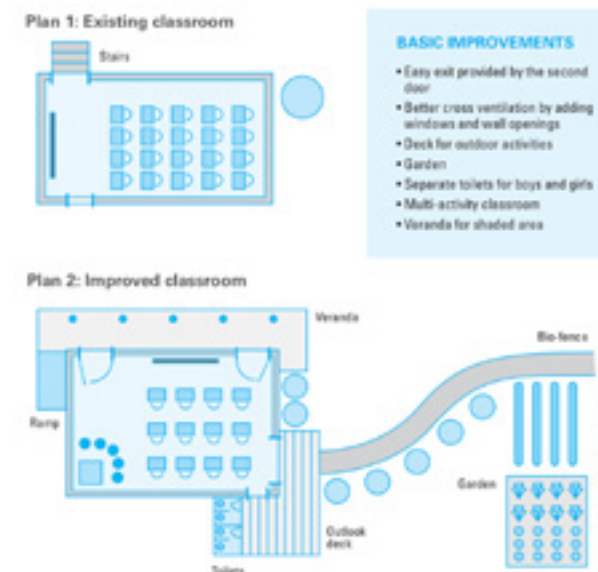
Floorplan with CFS improvements (Unicef 2019)
